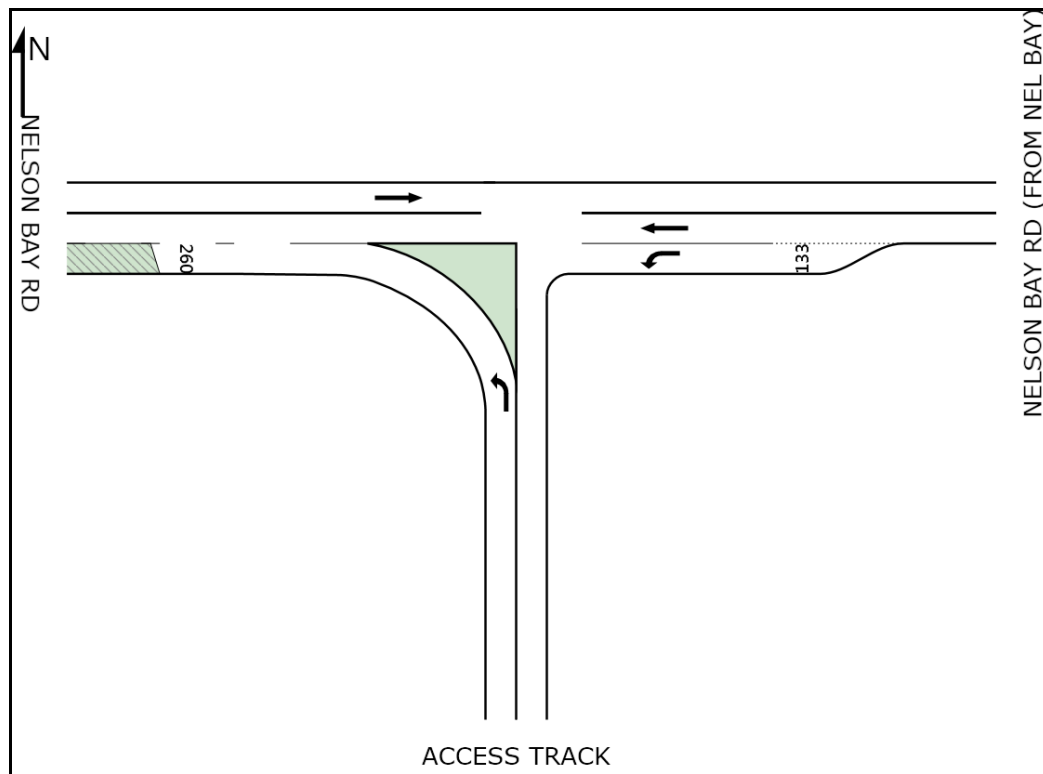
SIDRA GEOMETRIC LAYOUT
